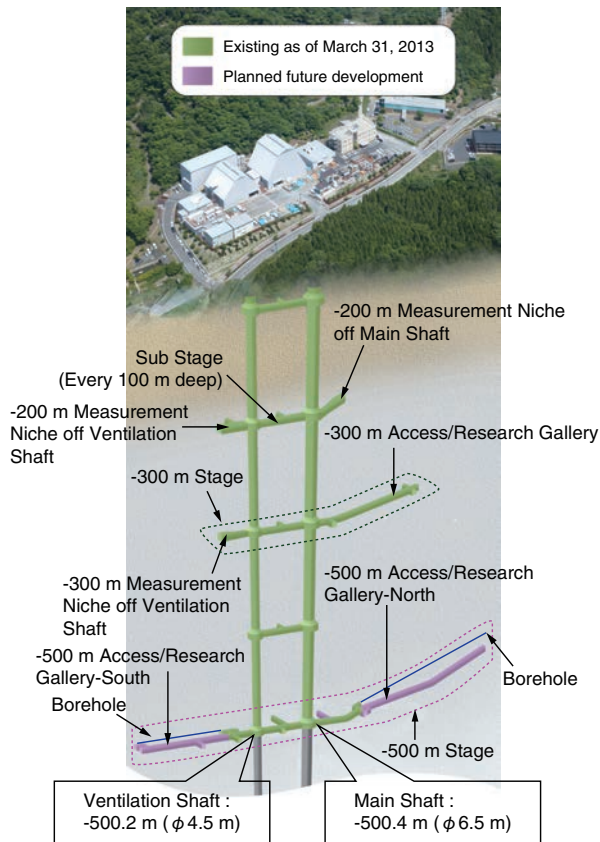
Layout of the Mizunami Underground Research Laboratory
